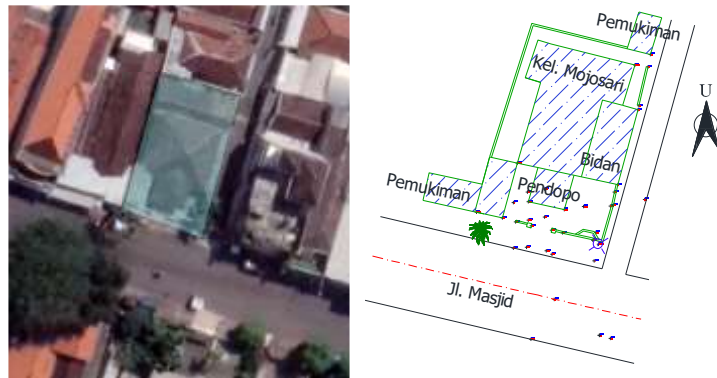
Location and Existing Layout of Kelurahan Office Planning
